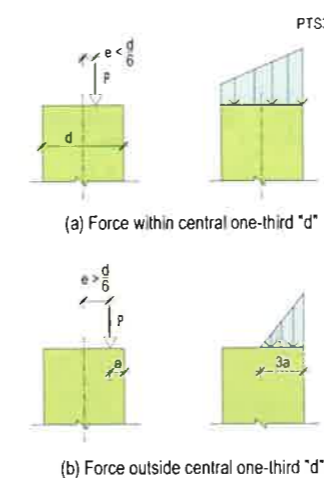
C-2 Axially Loaded Rectangular Section
